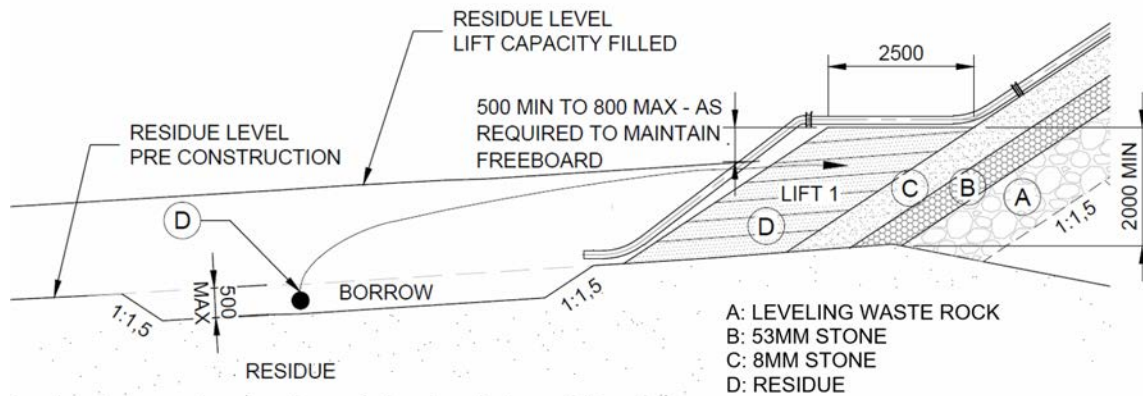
Venetia Mine tailings dam typical interface layer cross-section
